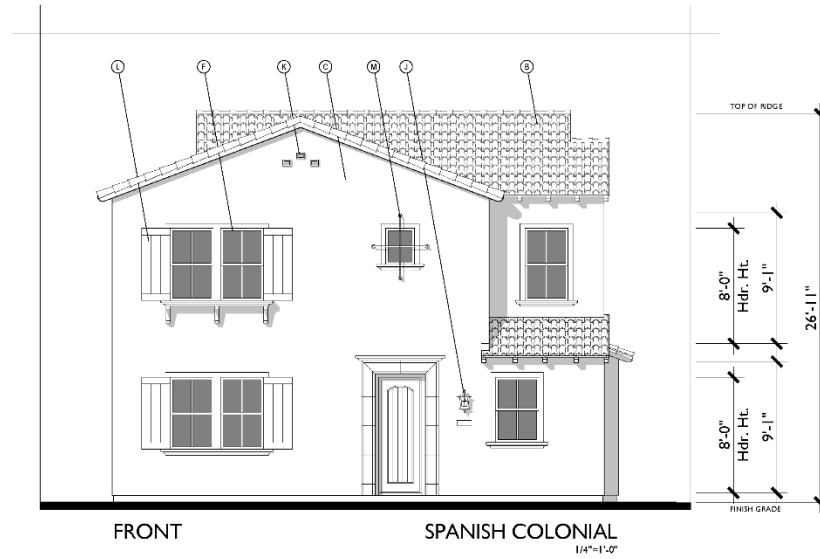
Spanish Colonial Elevation (Unique Condition)- Cluster Plan 3
